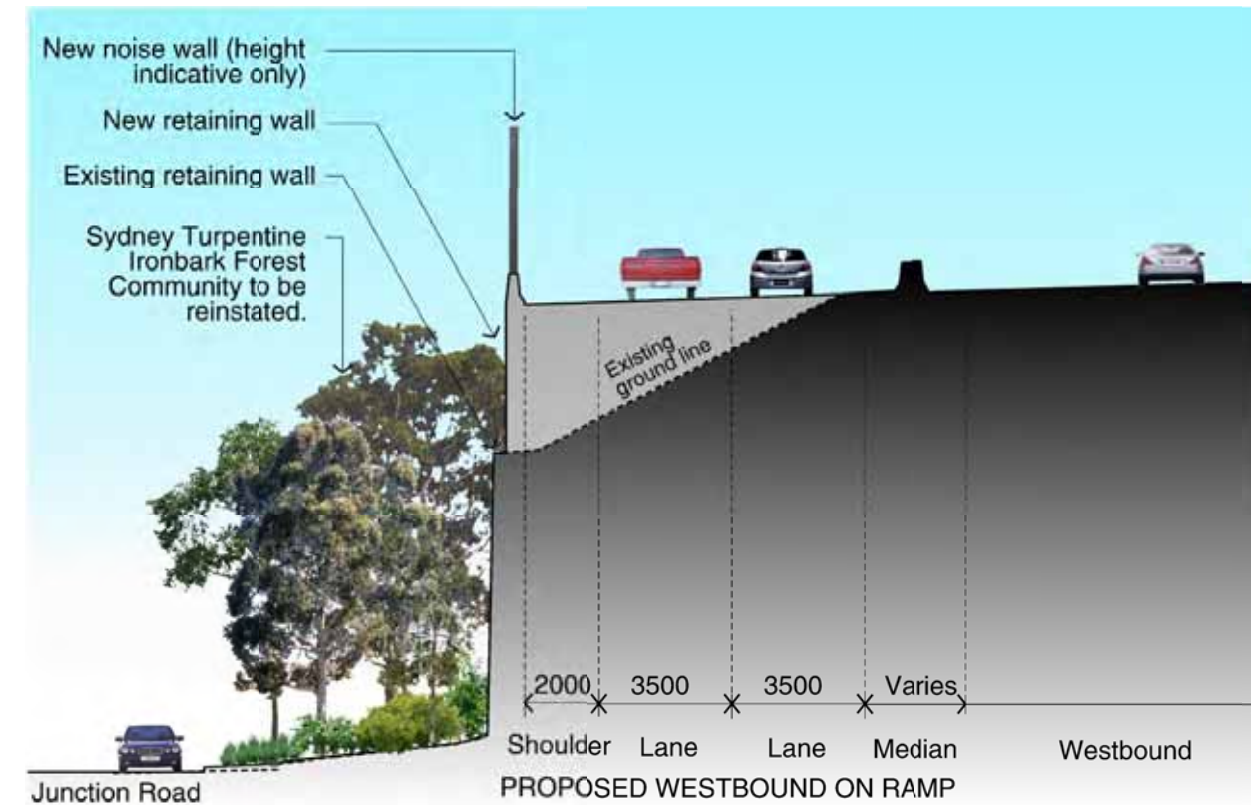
Stn 3700 Windsor Road on ramp (westbound) - Proposed
